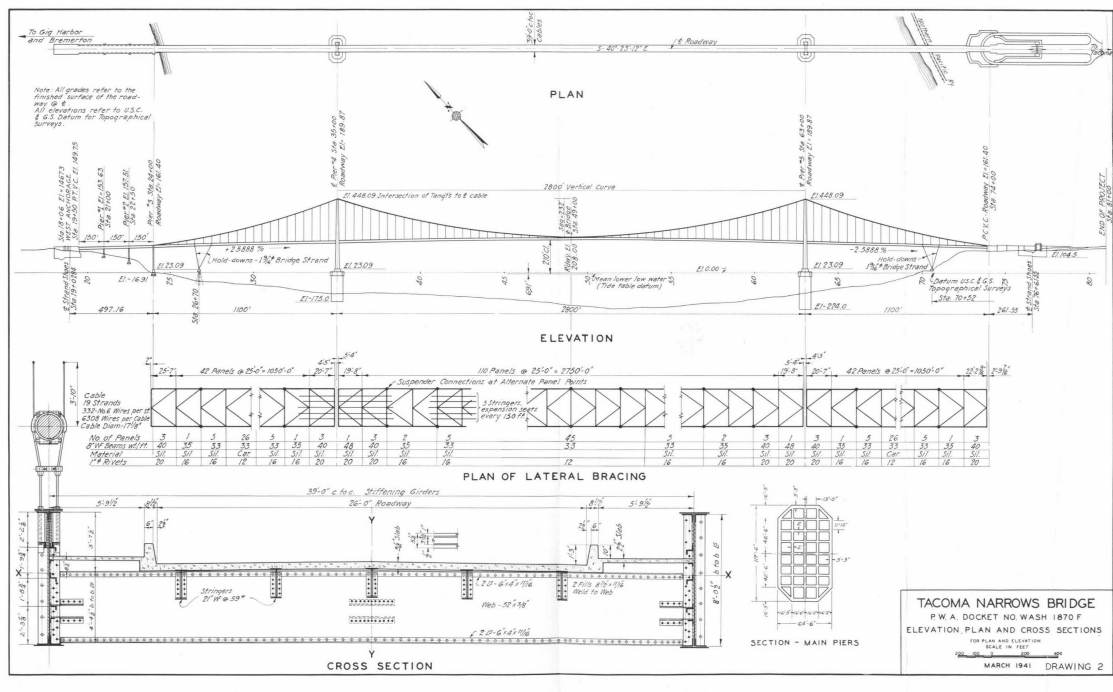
Sketches of TNB. From above the plan, the front elevation, the scheme of the deck's girder, the cross section of the deck and the pier. Source: [2].
